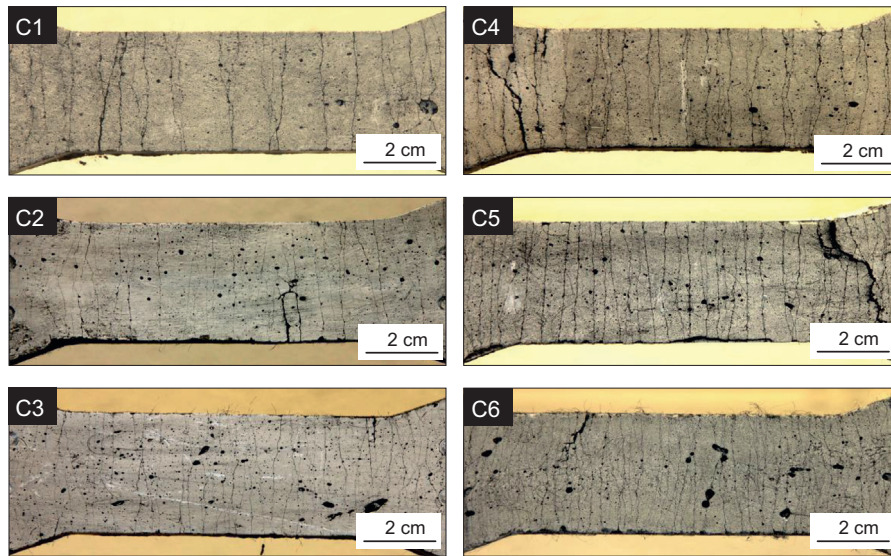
Observed crack patterns in GLECC specimens after tensile testing.
